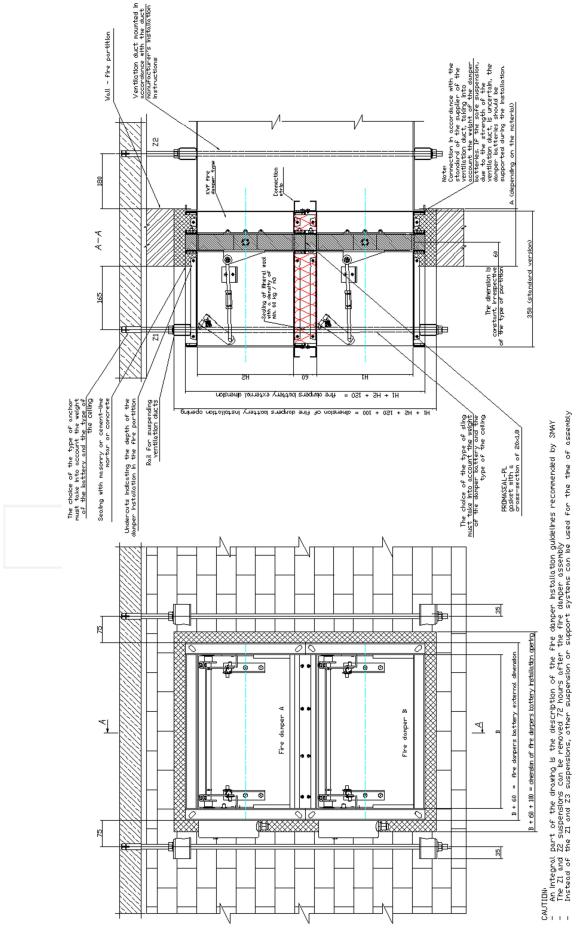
Installation of a battery consisting of two fire dampers KWP-O-Ex in vertical arrangement in wall
